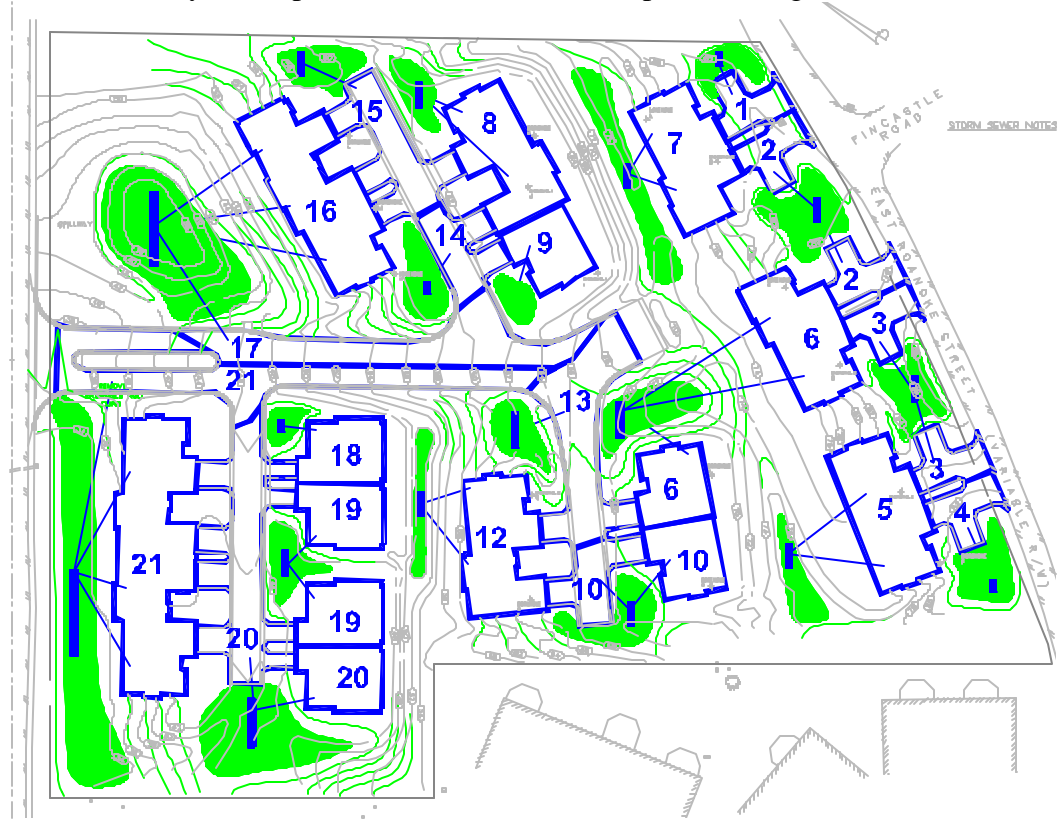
Example plan with location of Split-Flow facilities. Impervious surfaces are outlined in blue. The underground infiltration chambers are shown as small blue rectangles while above ground bioretention facilities are shown in green. Thin blue lines show which impervious areas and buildings are directed to which split-flow facilities.
